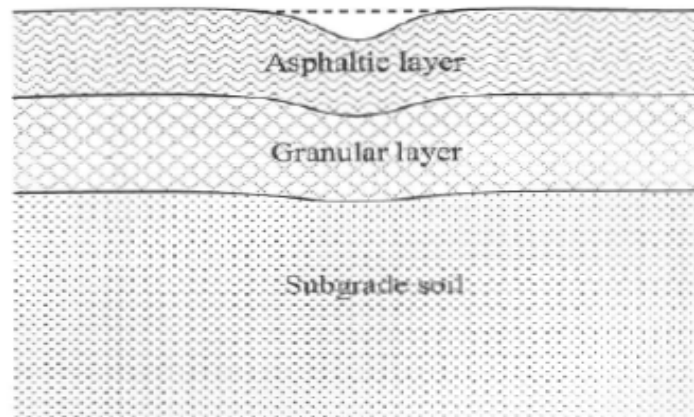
Rutting or Permanent Deformation in Road Pavements (Wang, 2011)
